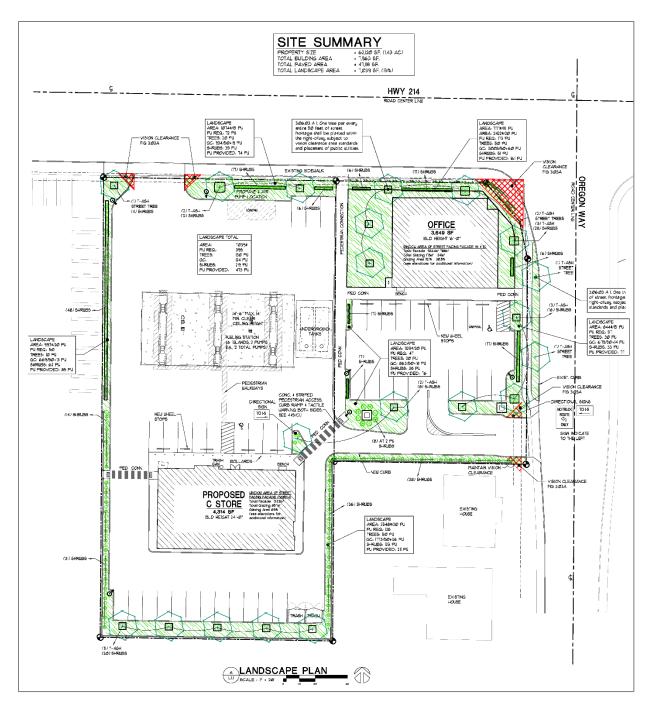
Option 2 Site Plan Excerpt Prior to Revision per Conditions of Approval
